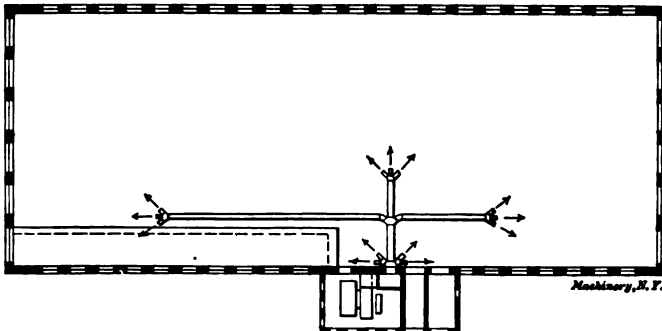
Heating Installation in a Building of Larger Size than the one shown in Fig. 31
